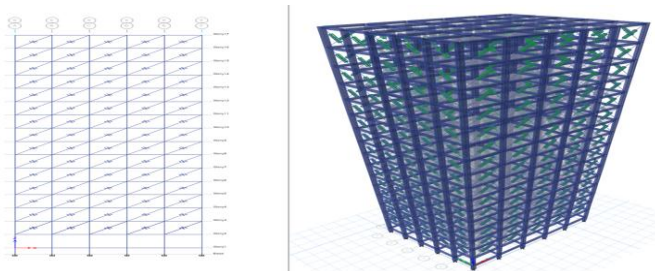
(G+15) storied building with brick infill wall and open ground storey.
